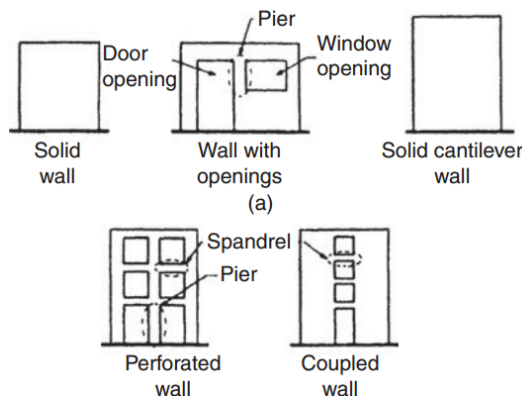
Types of shear wall, (a) single story, (b) Multi-story
